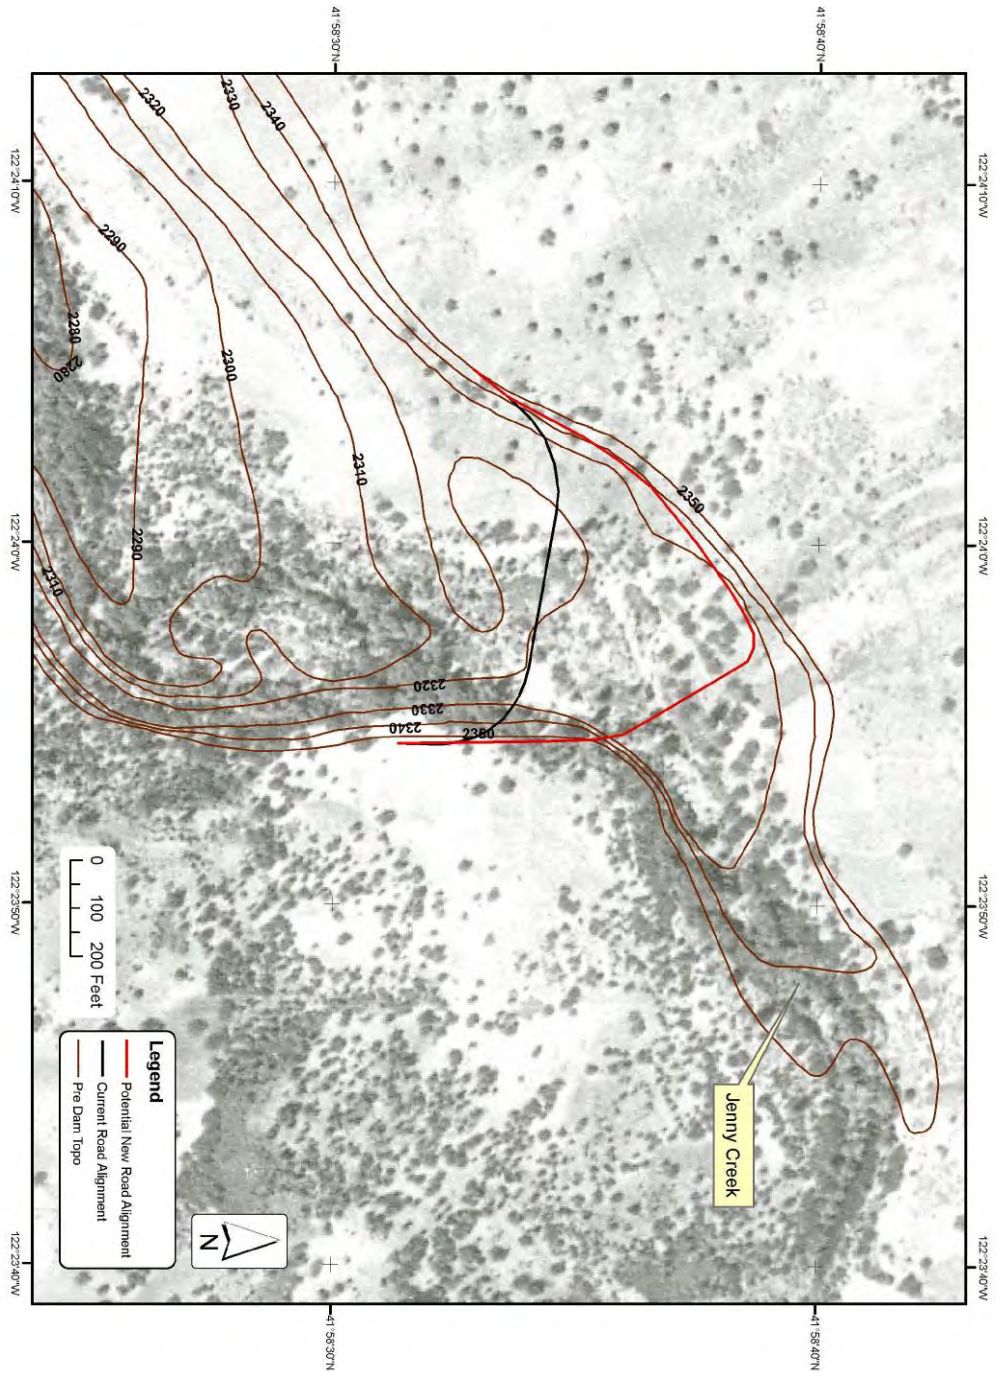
1960 Aerial view of Jenny Creek Bridge site with pre-dam topography shown.
